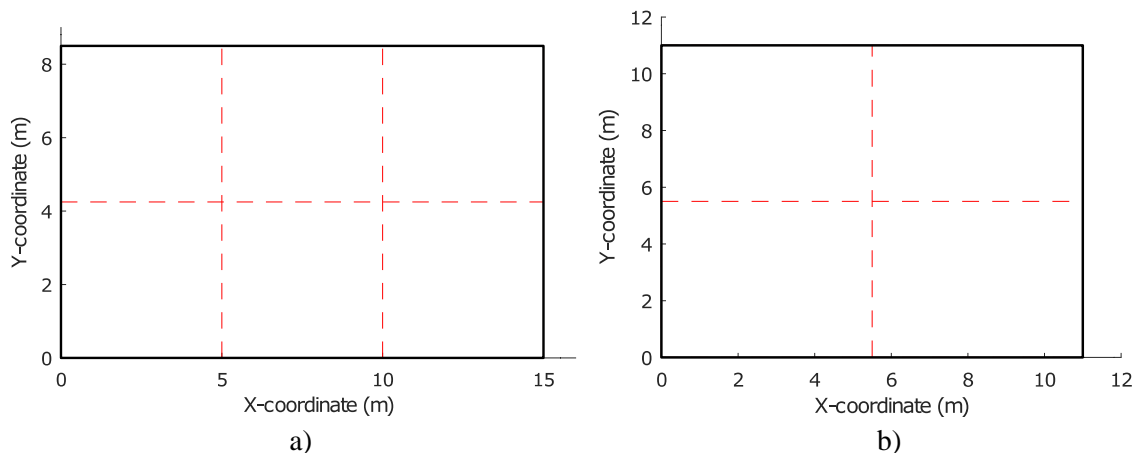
a) Design 1 floor beam layout and b) design 2 floor beam layout
